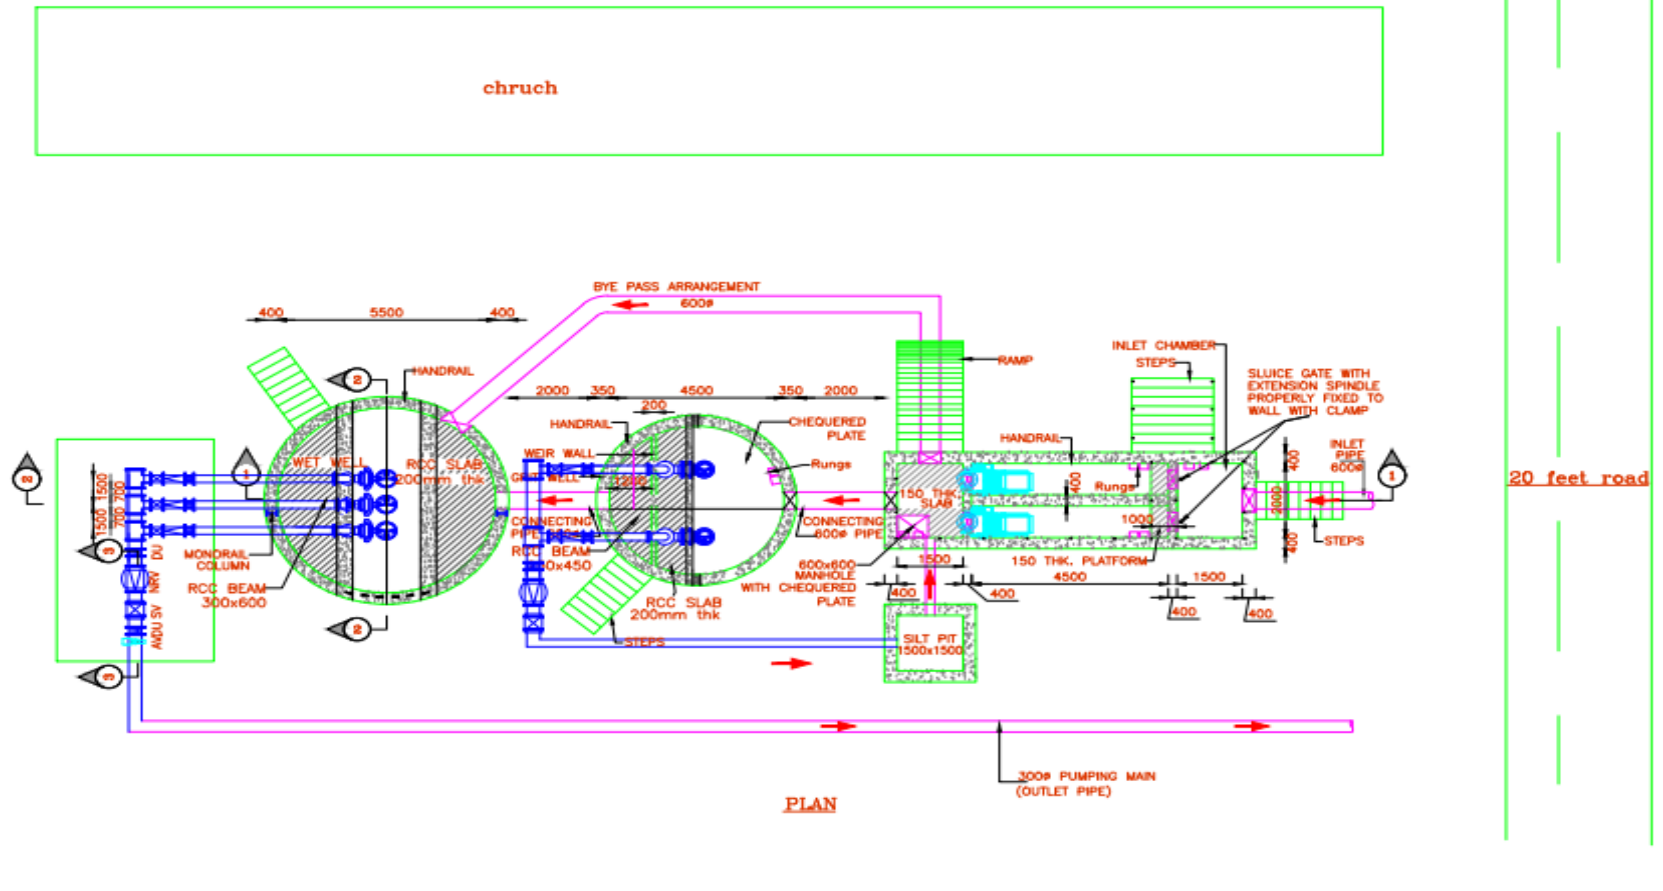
Layout Plan on Revenue Map for Sewage pumping stations9
